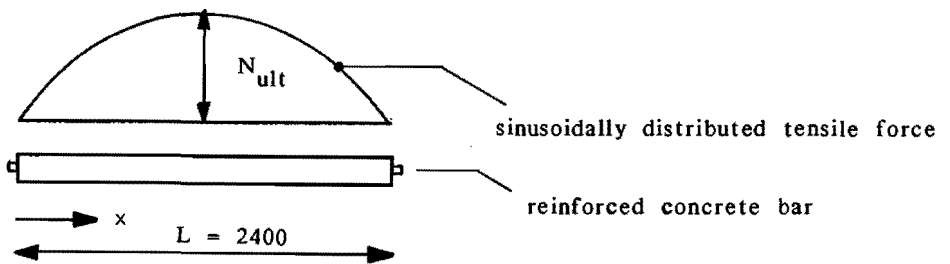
Reinforced concrete bar subjected to a sinusoidal tensile load.
